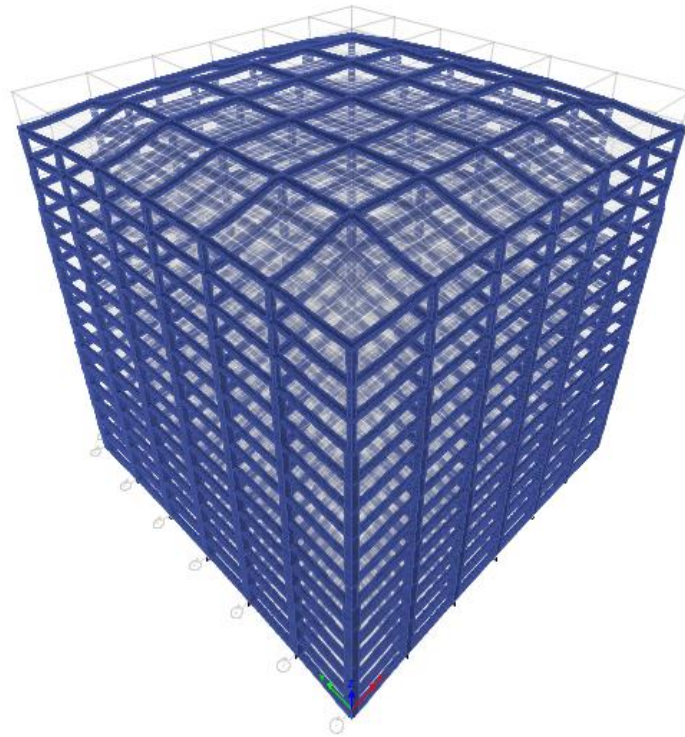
DIMENSIONAL VIEW OF WITH FLOATING COLUMN
